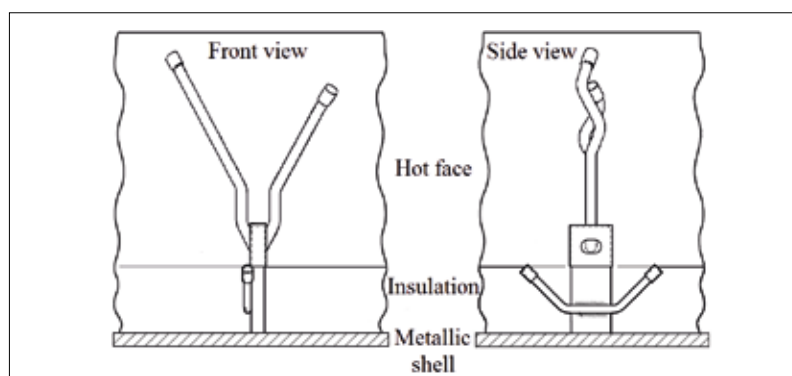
Metallic anchor shape used in an alumina calciner refractory lining
